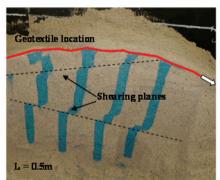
Failure mechanisms for rectangular trenches in sand.
